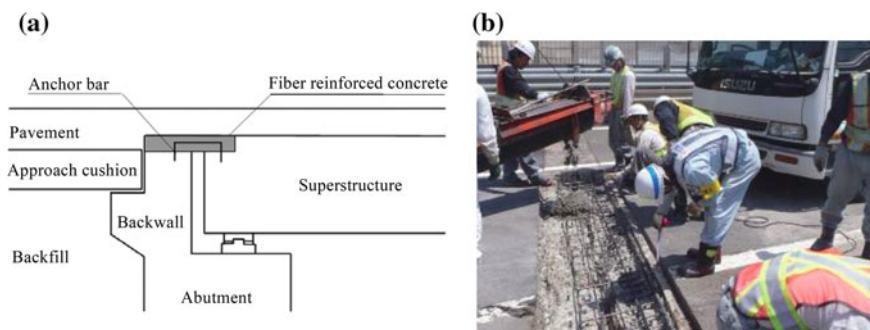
Jointless abutment–slab connection towards the prevention of leakage and corrosion deterioration in highway infrastructure, showing a the schematised connection and b the casting of the replacement seamless joint (Ishikawa et al. 2014)
